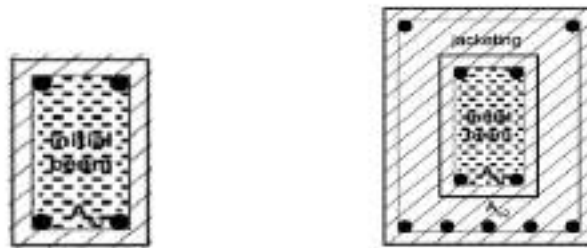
Cross-section of beams before and after jacketing (Source: Altun, 2004).
